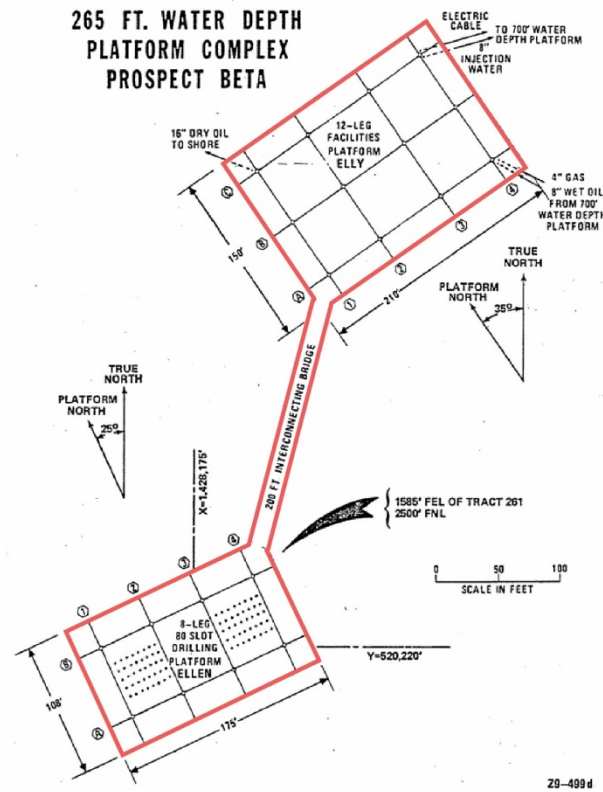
Plan of Platforms Elly and Ellen as seen in Development Plan (source: Shell Oil Company)
